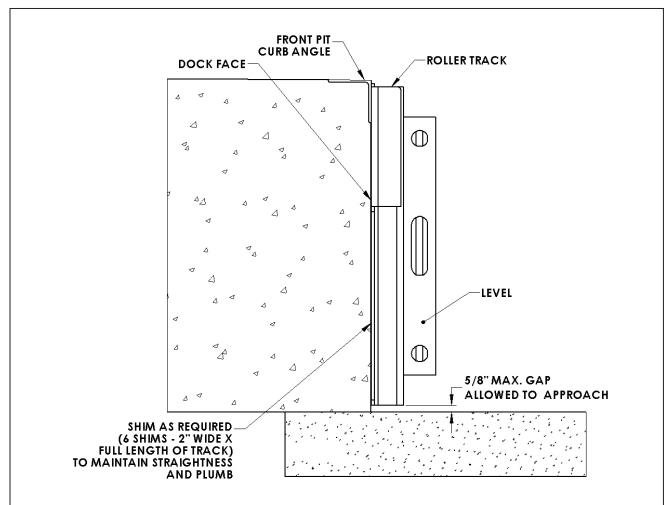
WELDING ROLLER TRACK SIDE VIEW
